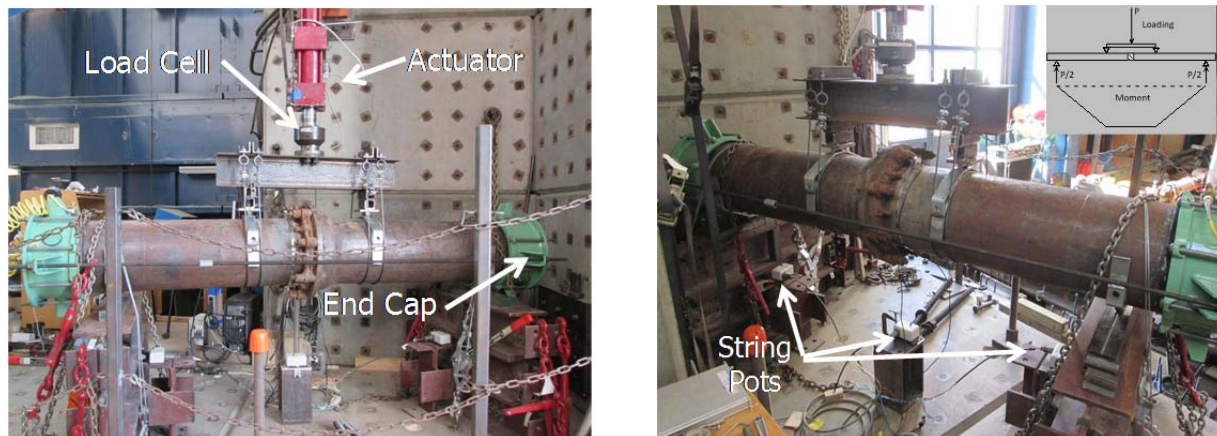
Flexure Test Apparatus with 12-in. (300-mm)-Diameter Test Specimen
